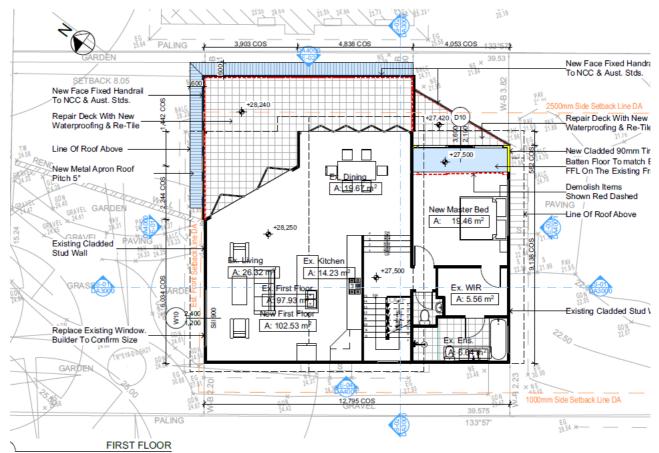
Original plans submitted with current development application which demonstrates that the deck is inconsistent with the
